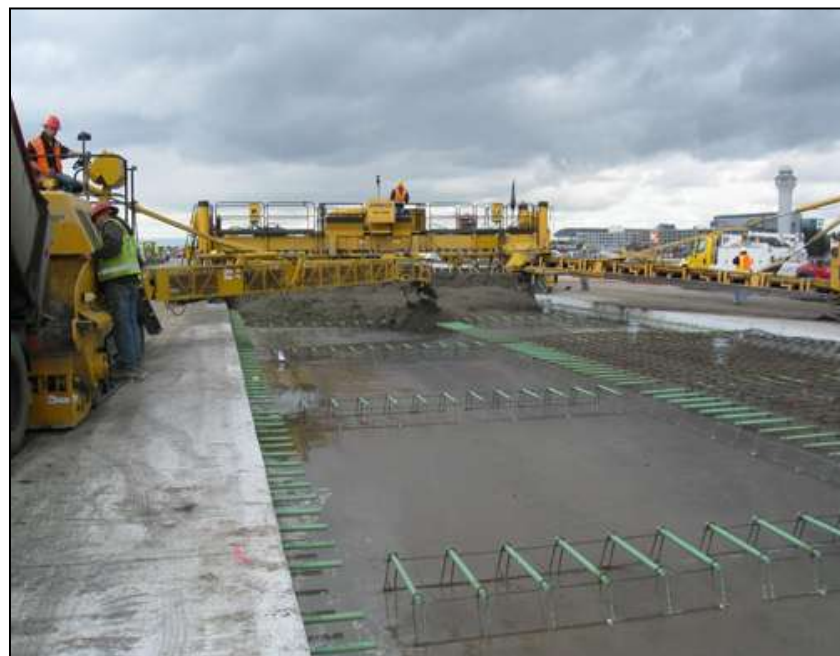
Tie bars with Longitudinal joint in Pavement Quality Concrete (PQC)
